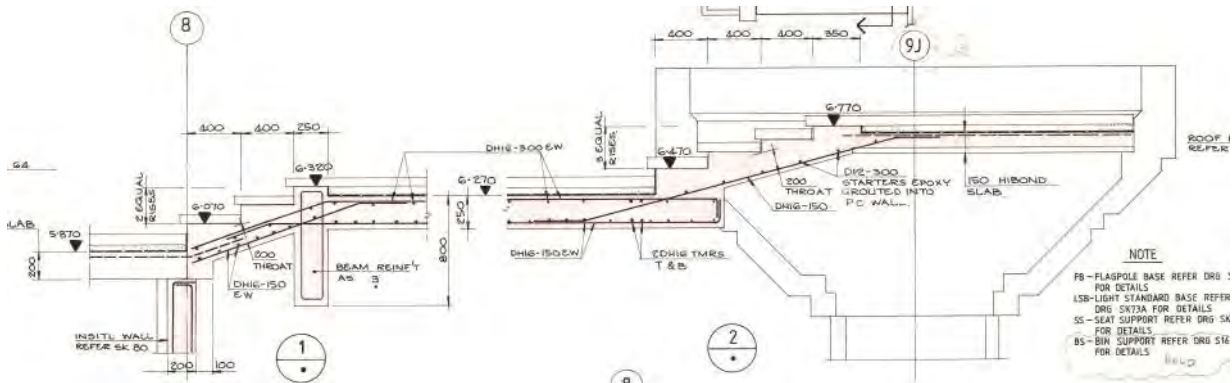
Extract from as-built drawing S30 - look-out tower connection to the rest of the structure
